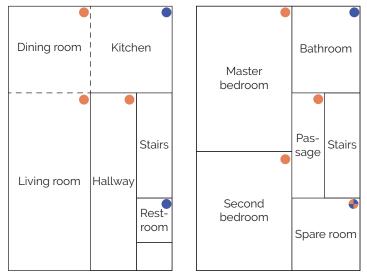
A blueprint of the ground (left) and first floor (right) of a terraced house with the kitchen in the back
